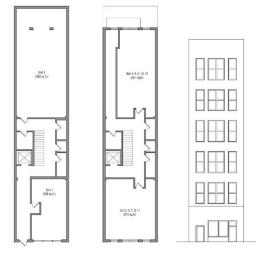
, 430, 431 (left to right): Building 15, first (ground) floor (1920); floors 2–6 (1920); street-front elevation (1974). For plans, north is down.
